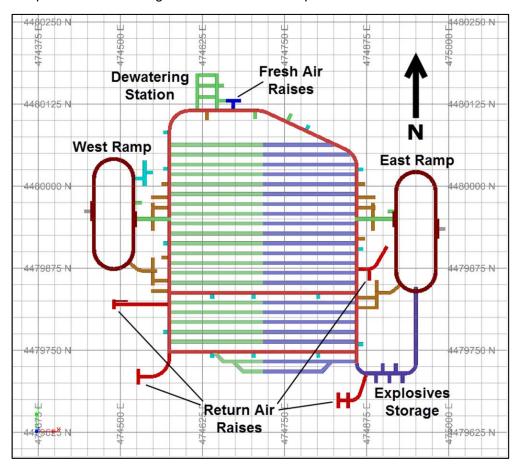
Typical Sublevel Arrangement (230 Level)
